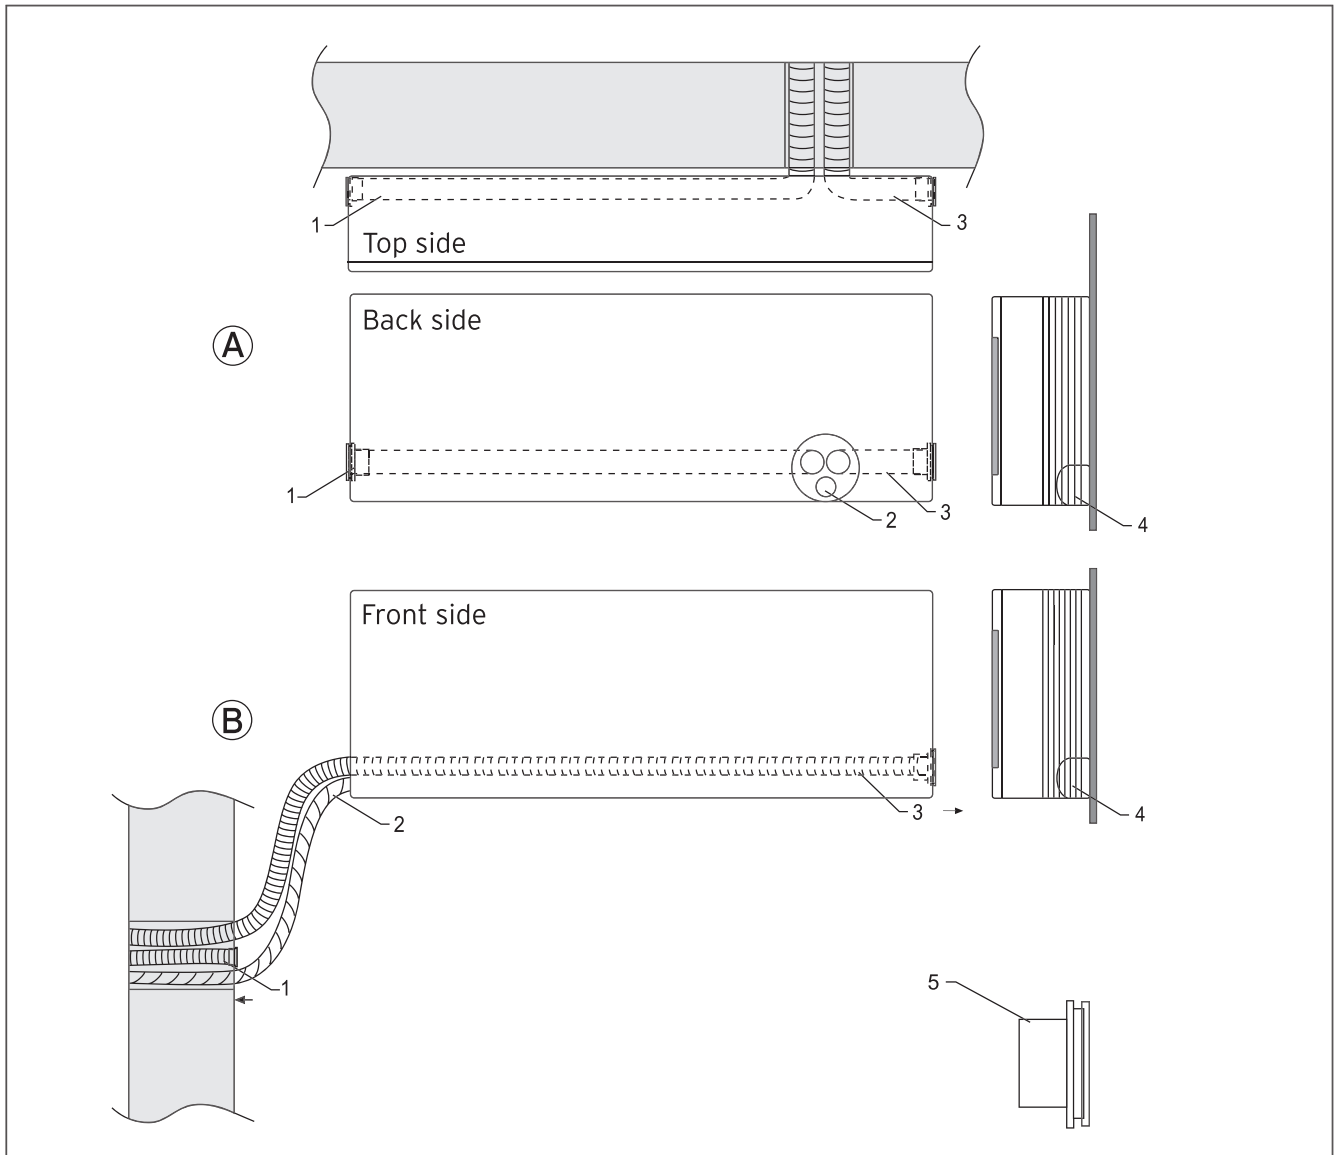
Installing the Pipes in the Indoor Unit.
